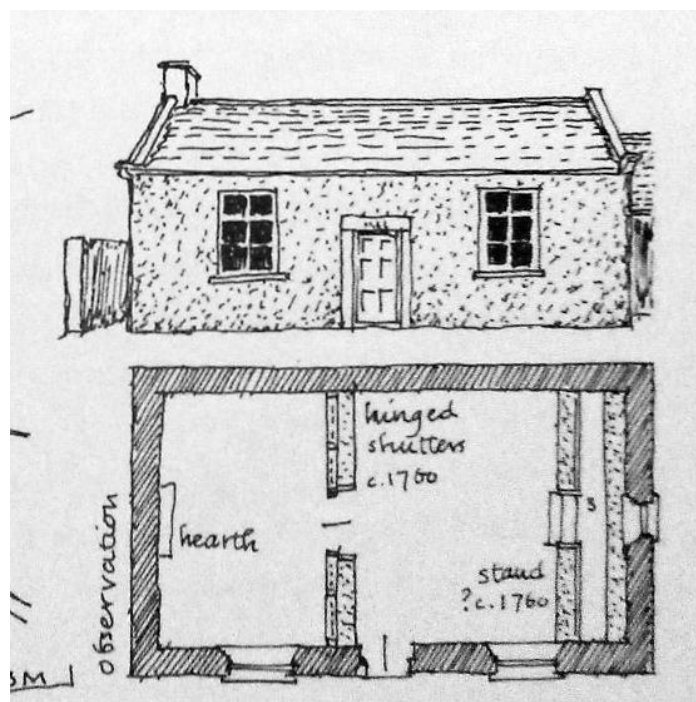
Example of a small meeting house: Skipton Meeting House, West Yorkshire, 1693. Ground floor plan (not to scale) (Butler, vol. 2, p. 837)
